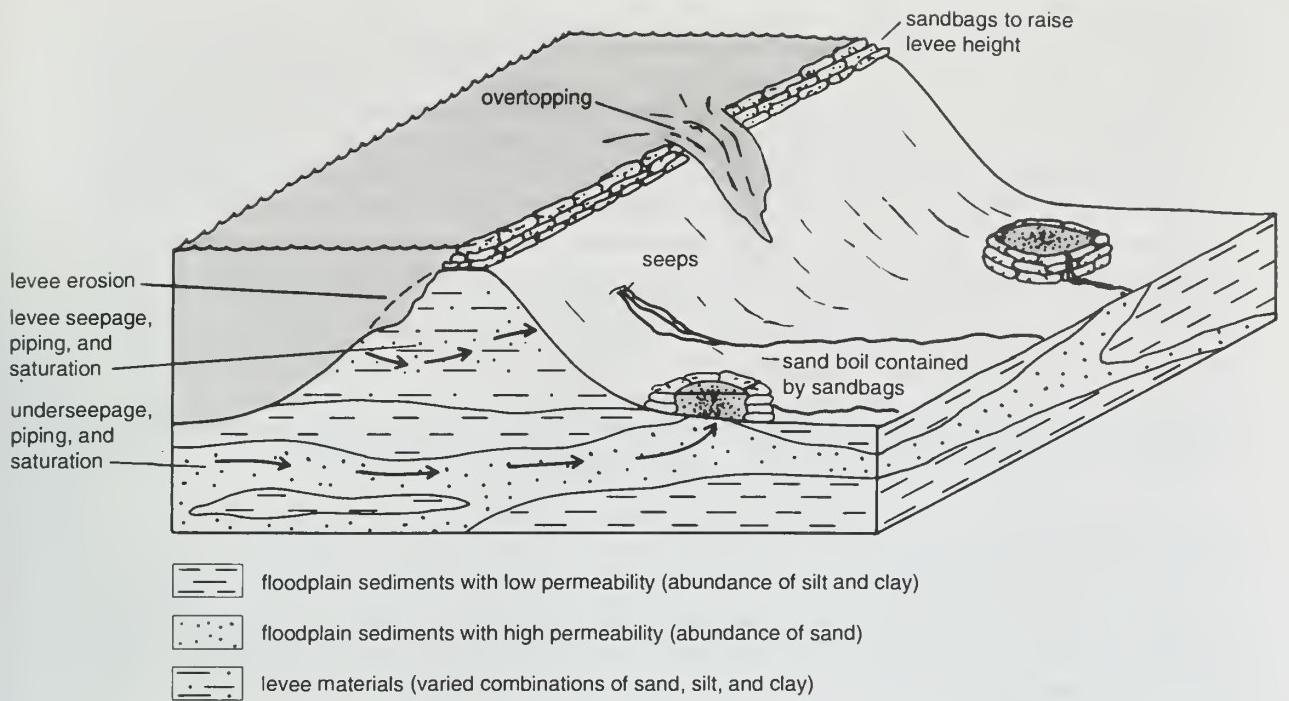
Overtopping, seeps, and piping move water over, through, or under a levee during a flood (after U.S. Army Corps of Engineers 1978).
